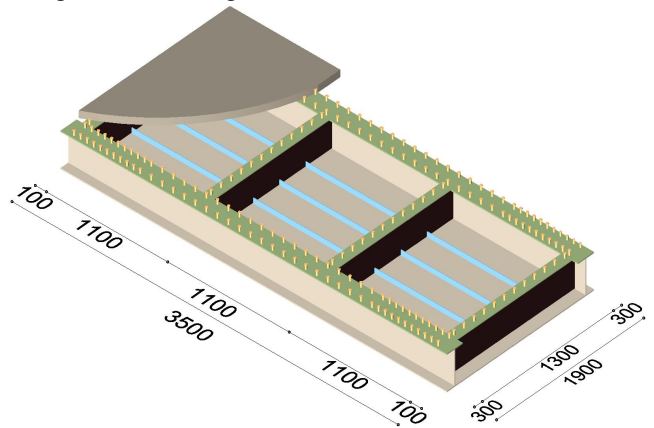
Overall view of steel-concrete composite girder(unit:mm)
